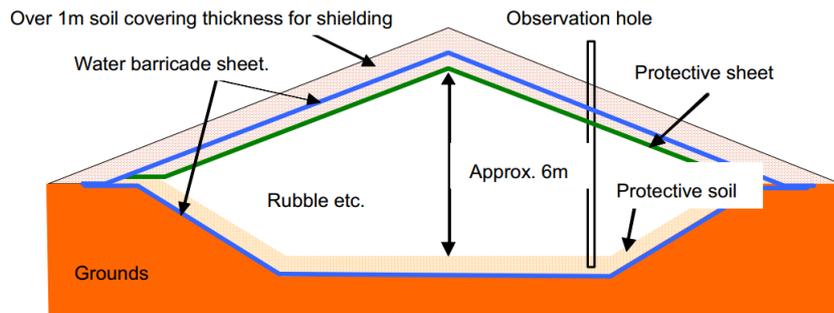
Layout of shielding for the temporary storage facility for rubble onsite
